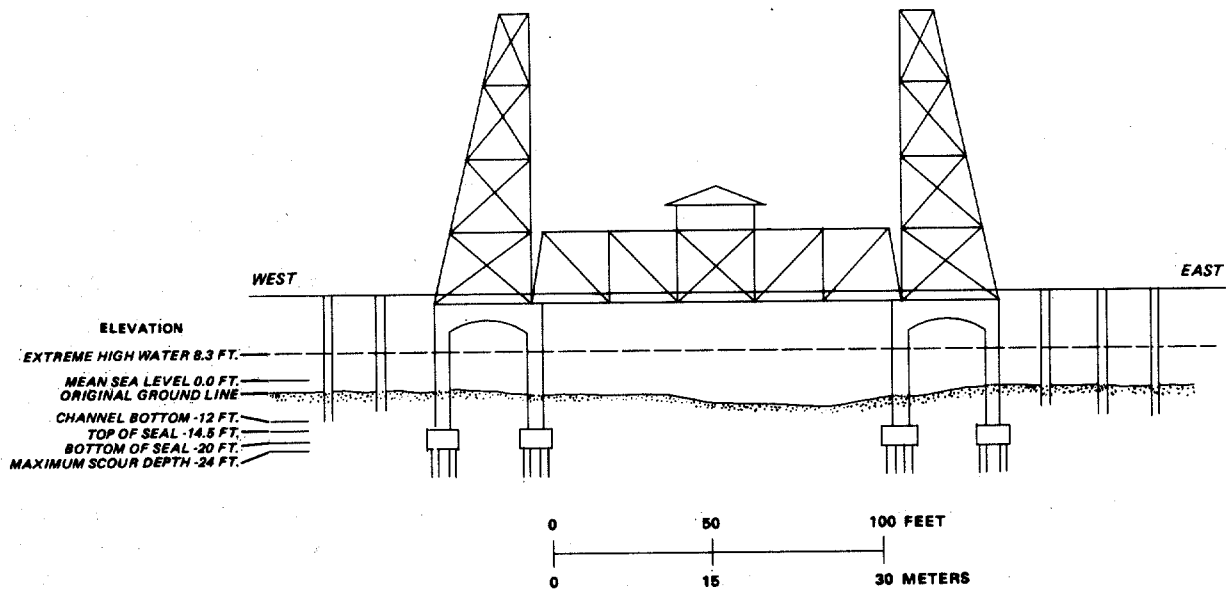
Elevation sketch of lift span of Swinomish Channel bridge.
